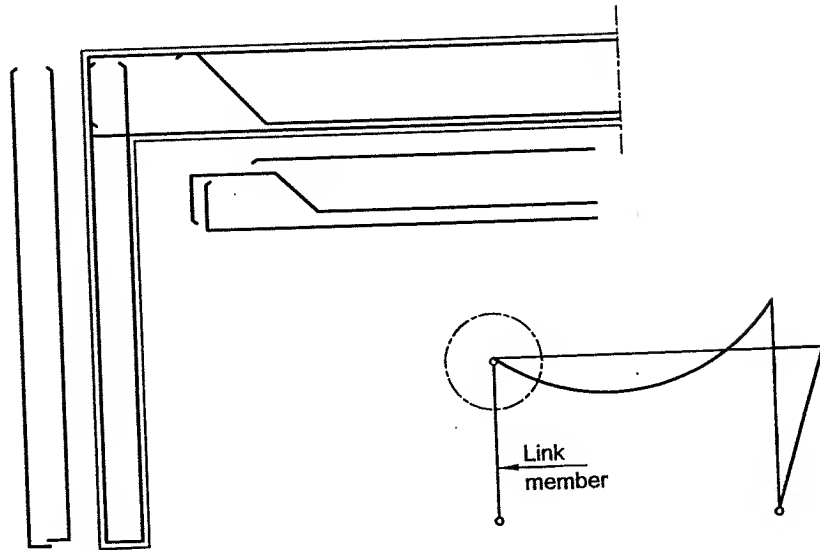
Detailing of Frame Joints (Detail-1)
